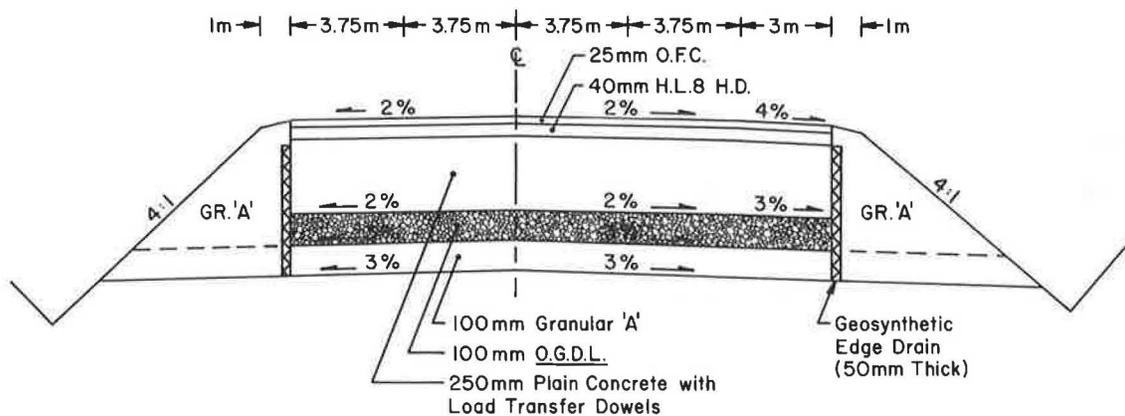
Example of highway pavement with open-graded drainage layer.
